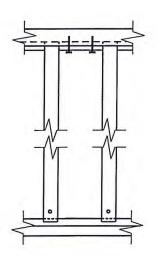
Exterior Connection: Infill Picket Nailed to Endcap - Endcap Screwed to Rail
